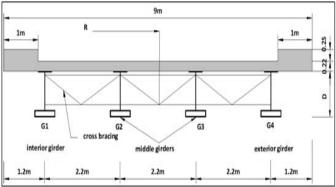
Cross sectional view of composite bridge model with model A steel girders.
